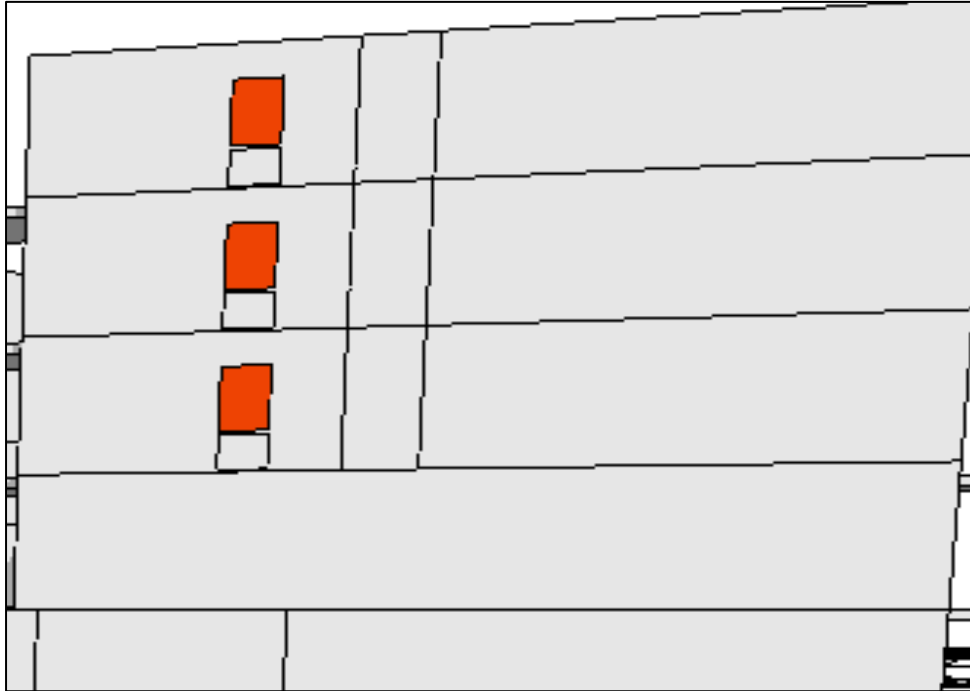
Windows achieving 1.5 hours of sunlight - South elevation of Building 01 (modelling software)
